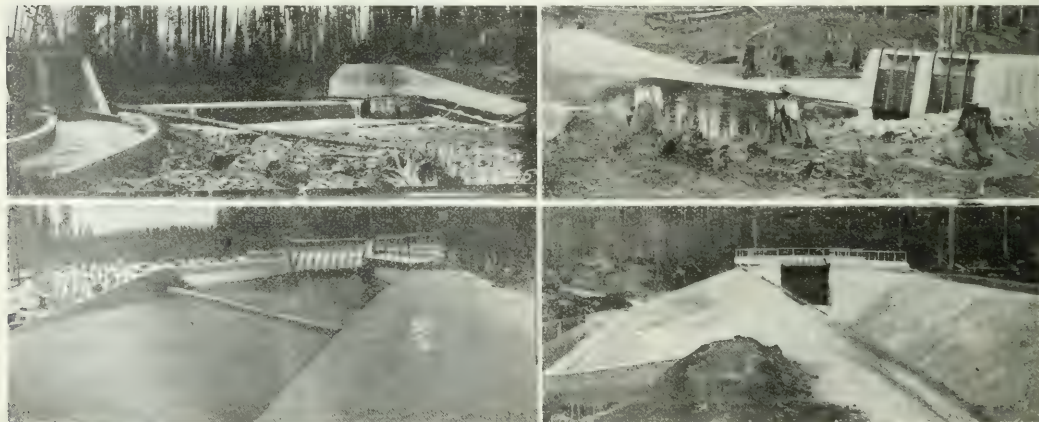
(upper left) Diversion dam looking upstream. Fig. 2—(upper right) Diversion dam looking downstream. Fig. 3—(lower left) Forebay for 8 ft. pipe line, two miles from diversion dam, showing Taintor gate. Fig. 4—(lower right) Forebay before water was turned in.
